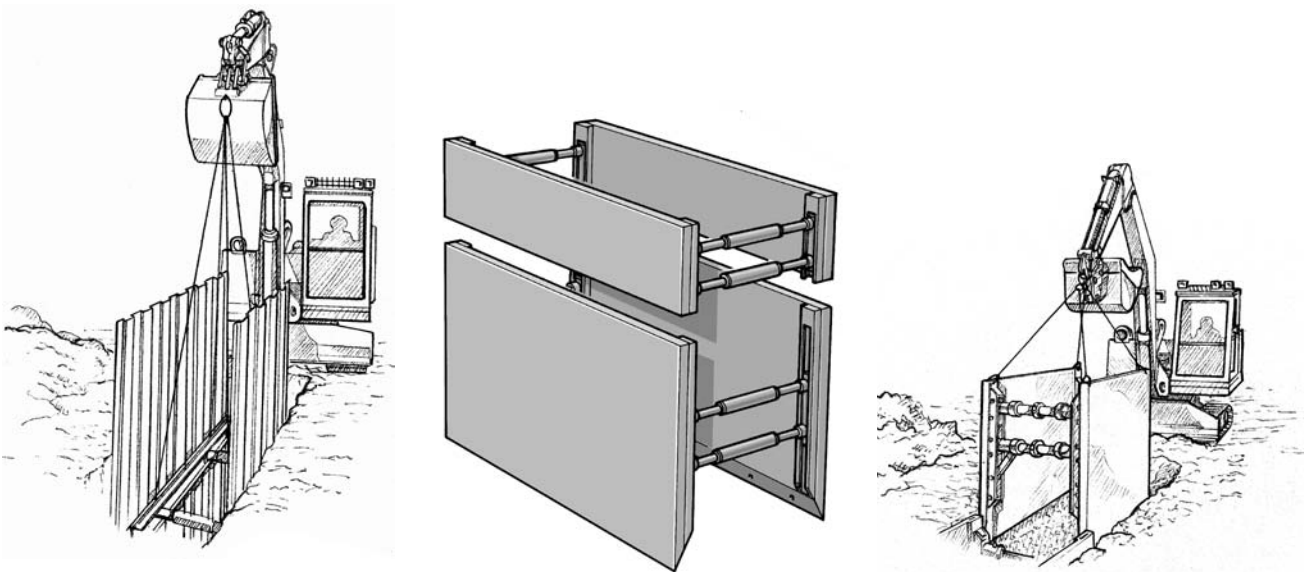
Proprietary trench boxes and hydraulic wallings allow trench supports to be put in place without requiring people to enter the excavation
